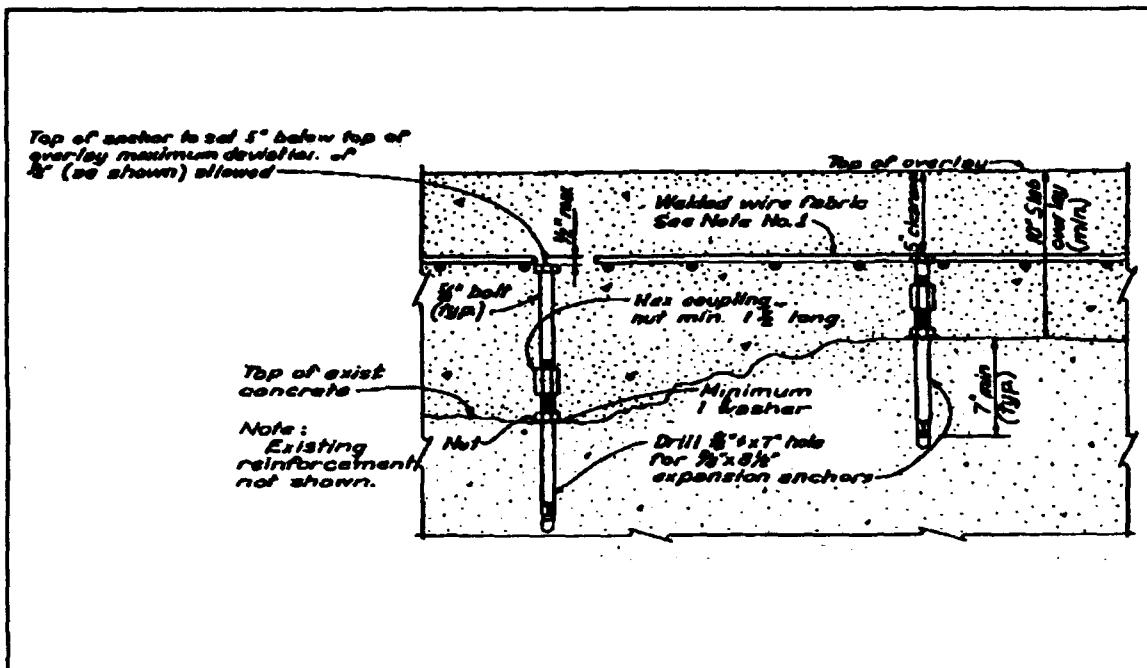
Overlay and anchor bolt details, Tuttle Creek Dam Stilling Basin, 1975
